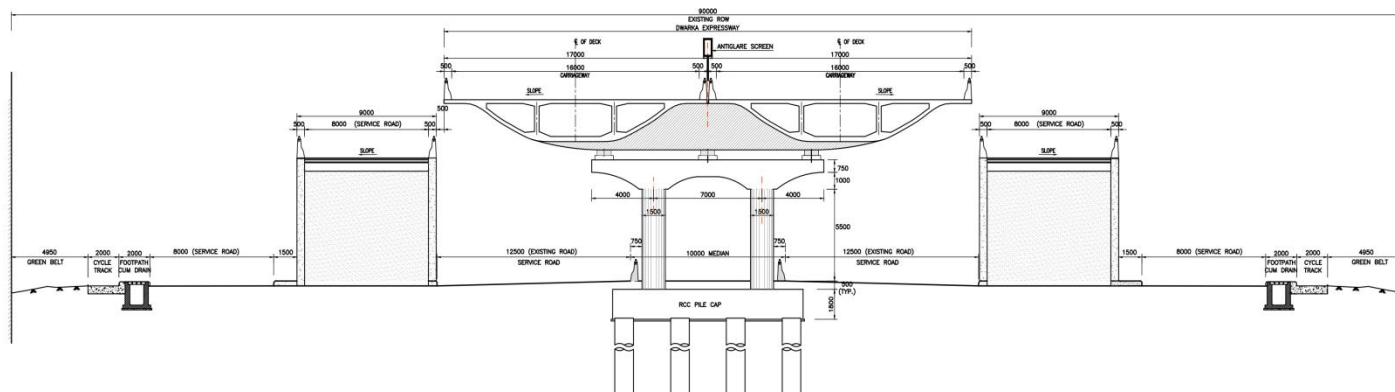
Typical Cross Section (TCS – 4) of Elevated Portion with Service Road on Ramp
